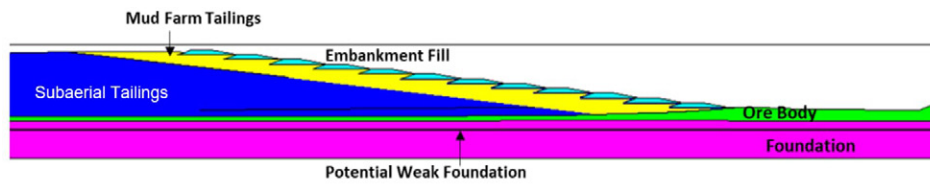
Typical section in the upstream mud-farmed TSF showing the structural zone in yellow and the potential weak foundation in black
